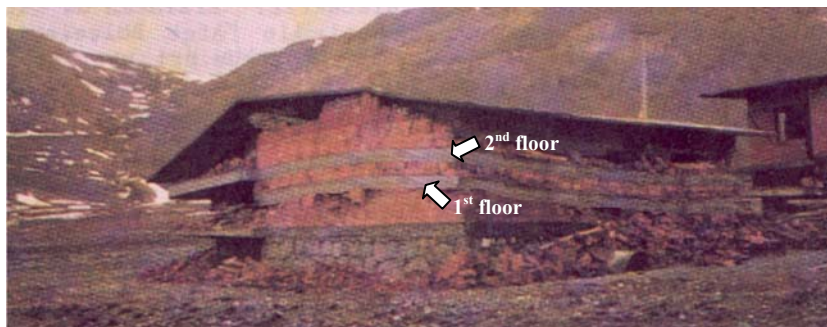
Two-storey building collapsed during Erzincan Earthquake (Bayülke & Doğan, 1993)
